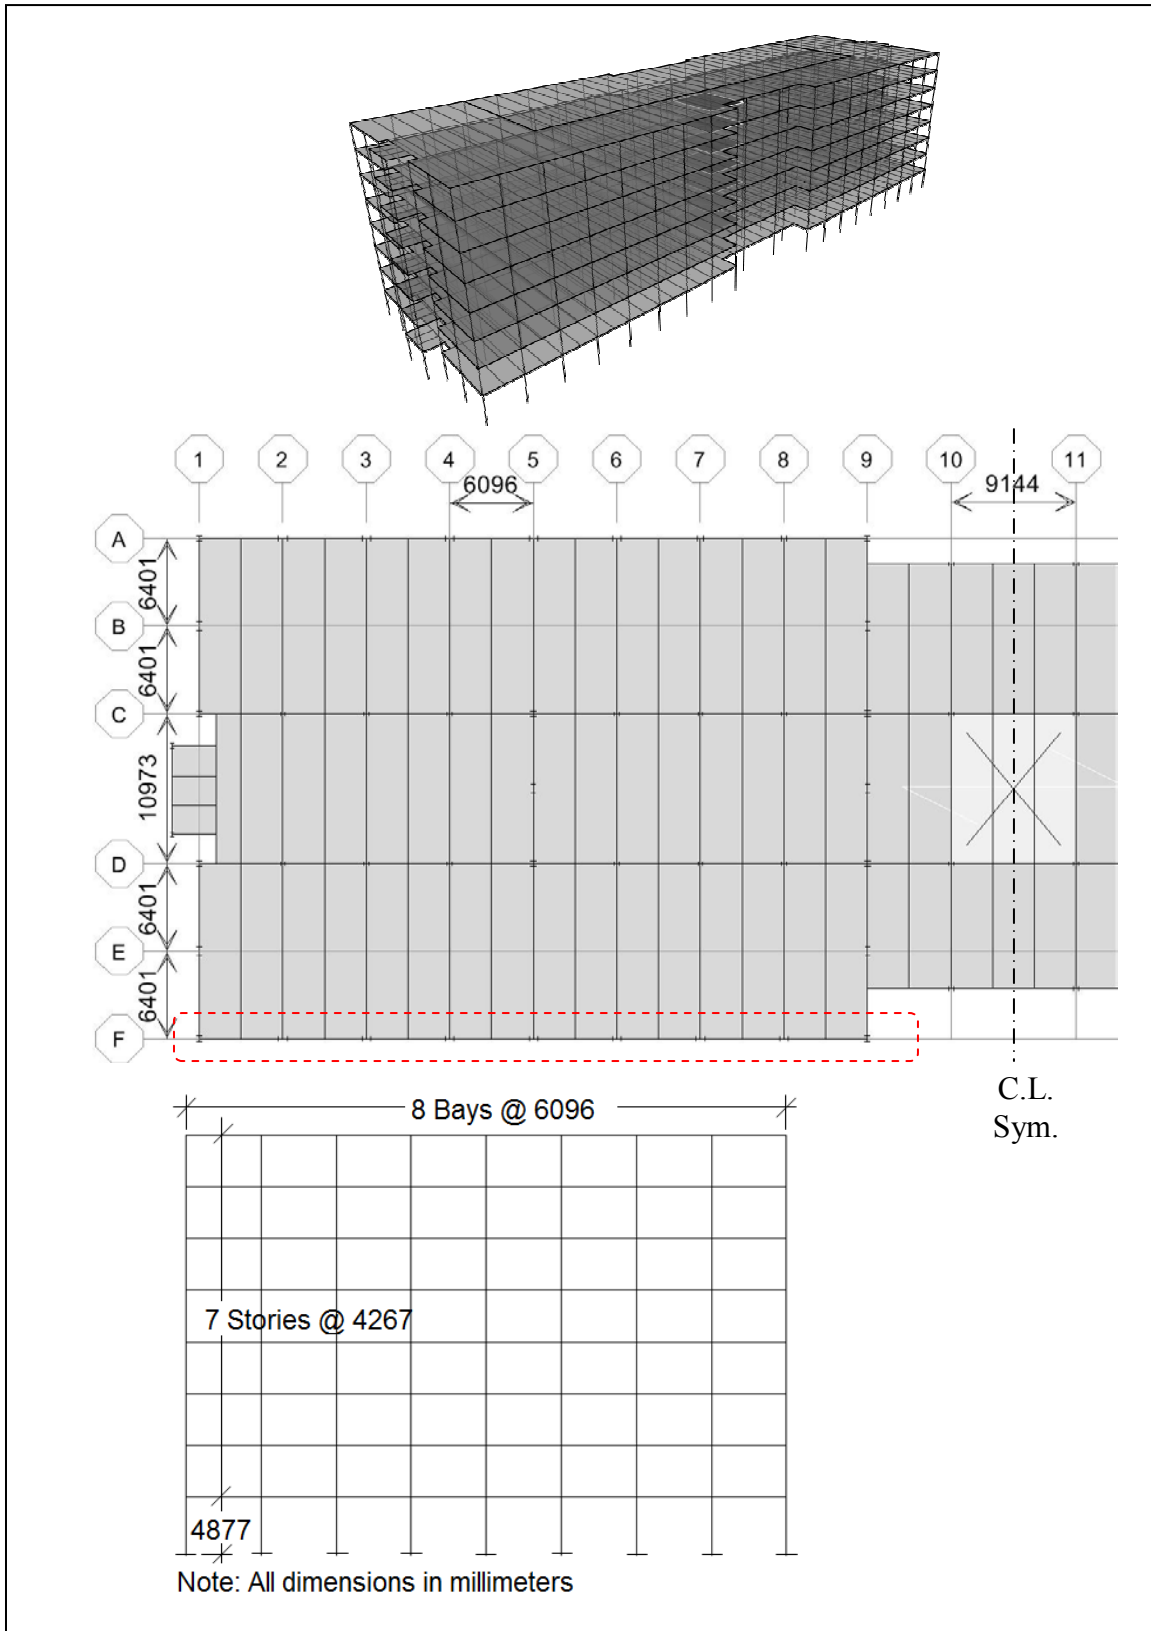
Building MF-2 3D, Plan and Section at Gridline F
